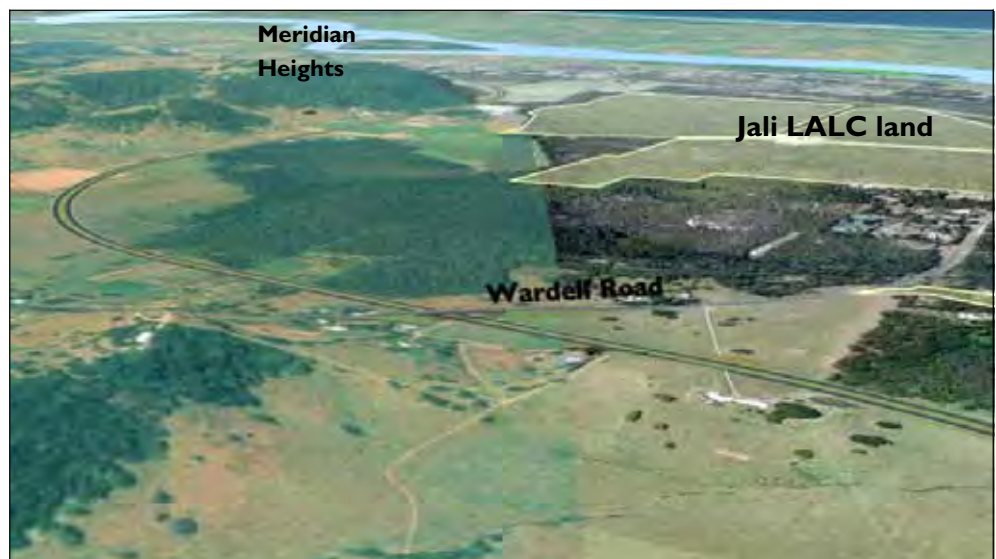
Artist impression looking north-east from crossing of Wardell Road
